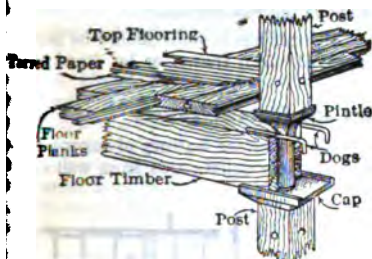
Post-cap and Pintle for Floor-timber and Columns
